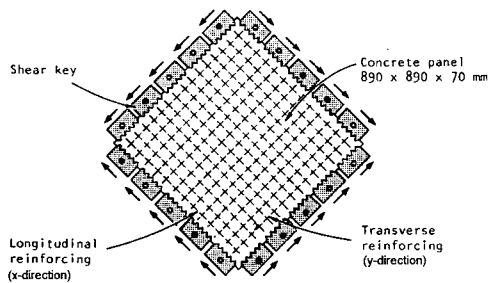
The specimens and loading directions tested by Vecchio and Collins
